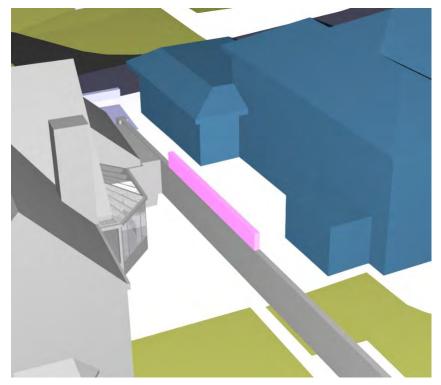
Assessed wall height scenarios (1.8m wall in grey, and the additional height of the 2.5m wall in pink)
